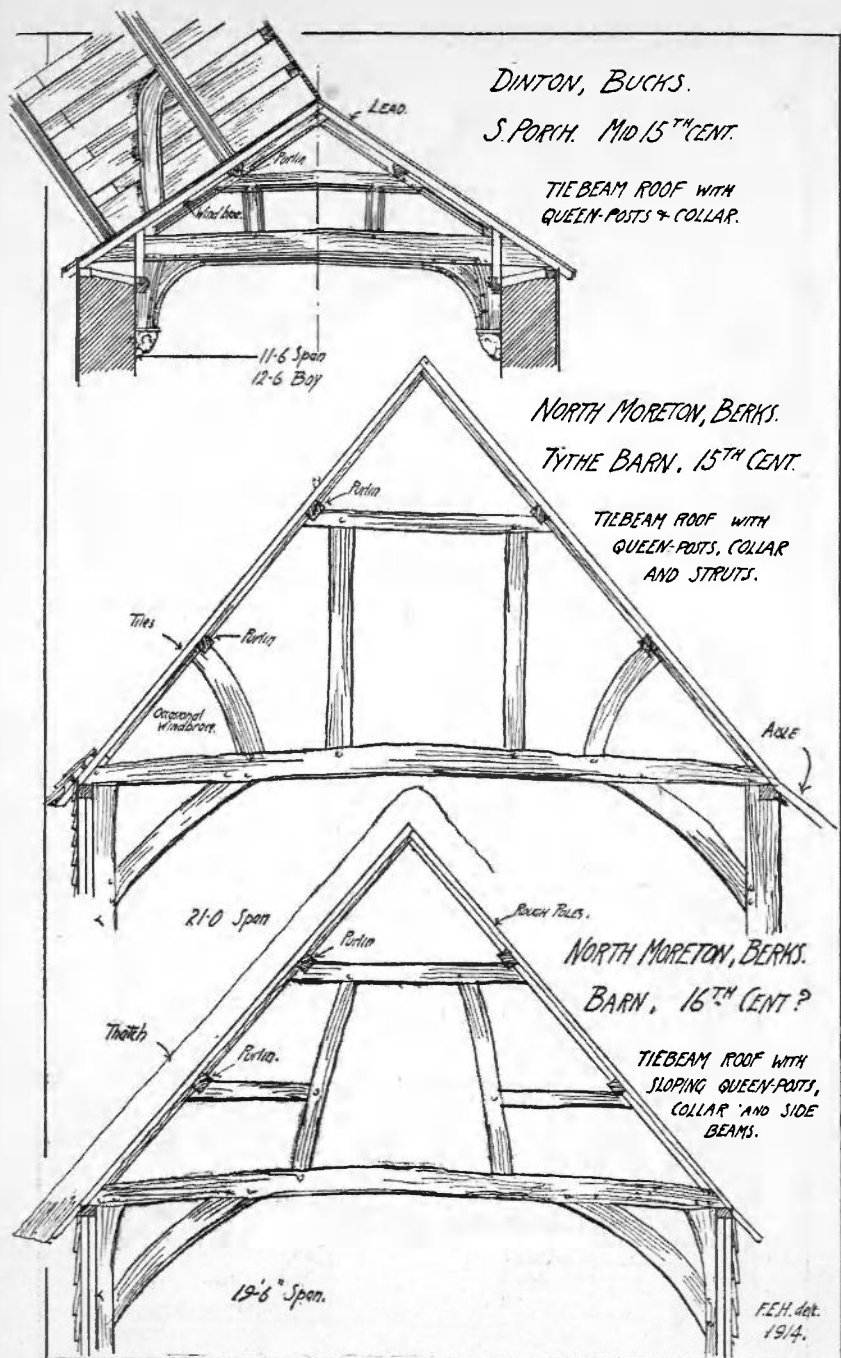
TIE-BEAM ROOFS WITH COLLARS AND QUEEN-POSTS.
